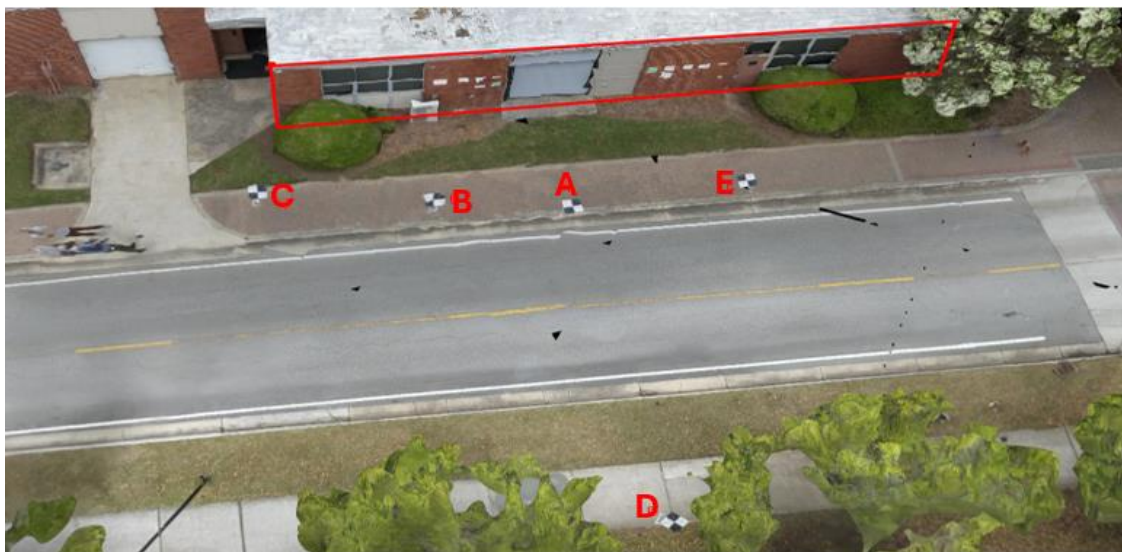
Photo. Aerial view of the CW site with the test section outlined in red and GCPs A–E marked for spatial referencing
